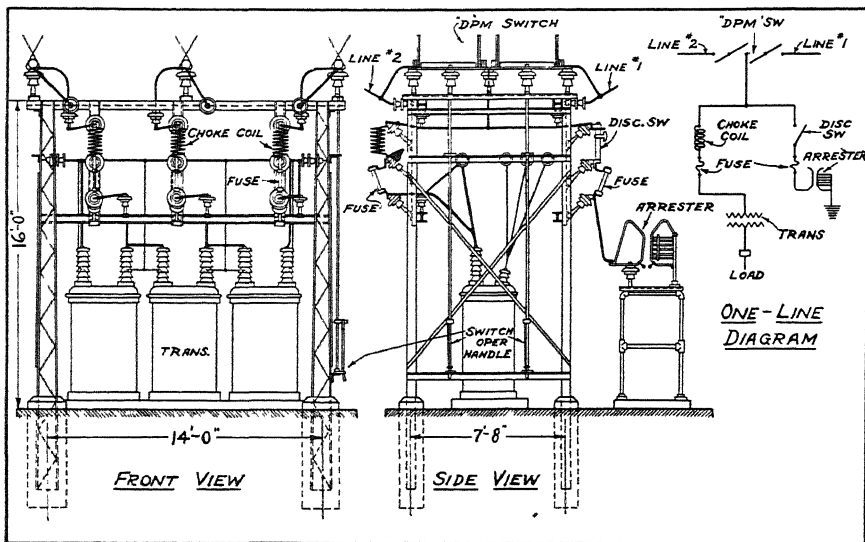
STEEL TOWER SUBSTATION WITH TRANSFER TYPE SWITCHES FOR CONNECTING TRANSFORMERS TO EITHER OR BOTH OF TWO PARALLEL AND SYNCHRONOUS LINES
